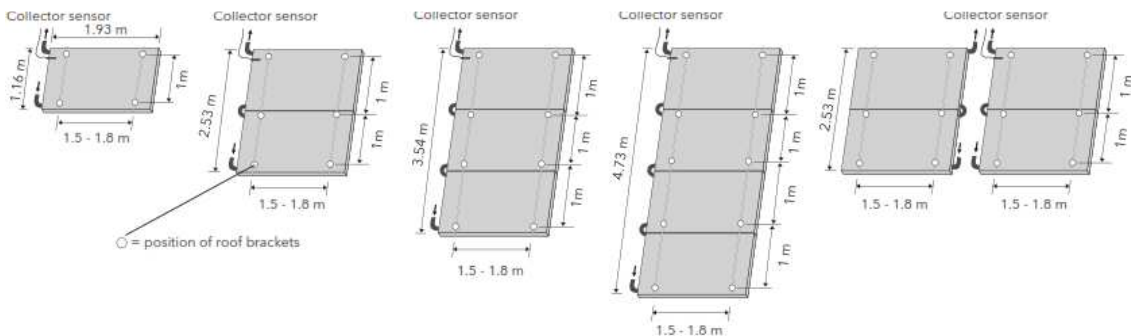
Horizontal collector arrangement: Up to 4 EURO C22 in serial connection. The mounting rails run vertically. Combination of parallel and serial connection (see right) is possible as well.
